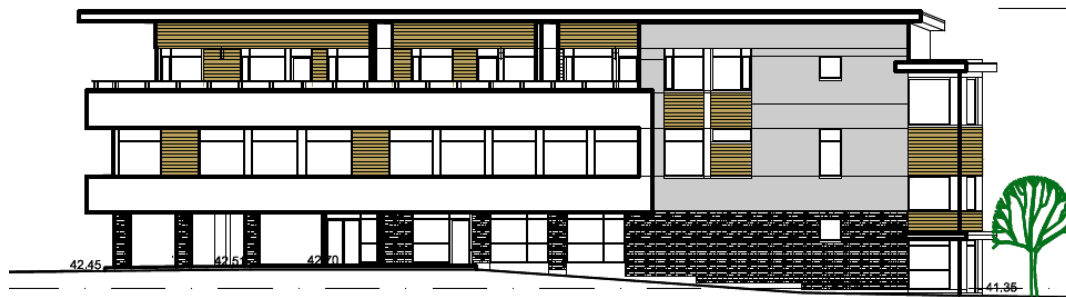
Front/Street Facing Elevation - from plans by O.C.A. Architecture Inc.
